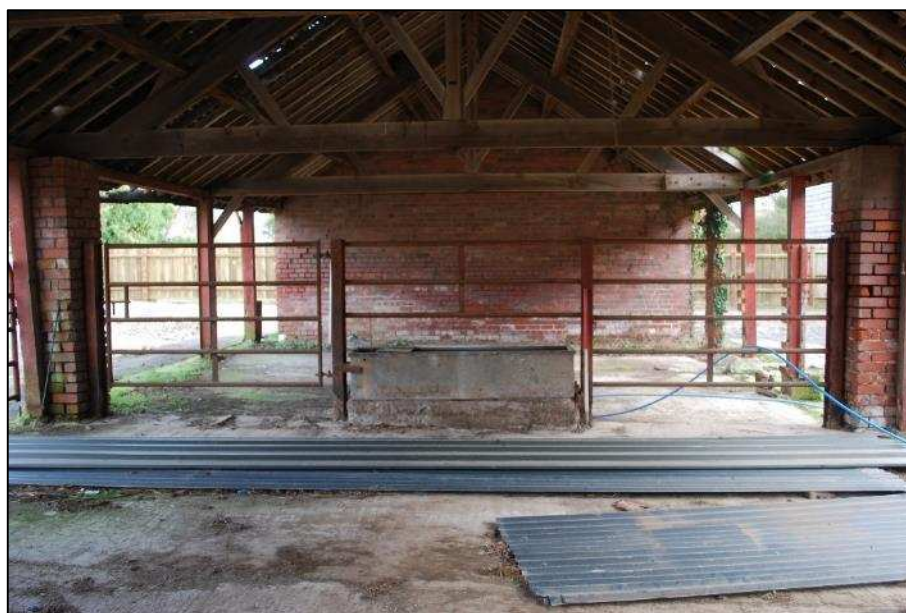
(Shot 83): Gates and trough dividing the room, looking east
